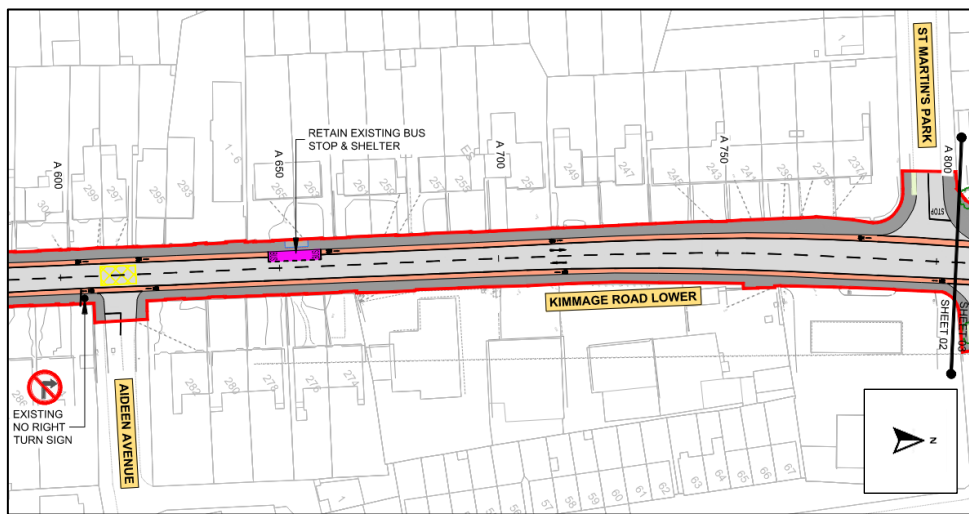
Existing Road Layout Retained on Kimmage Road Lower South of Sundrive Cross
